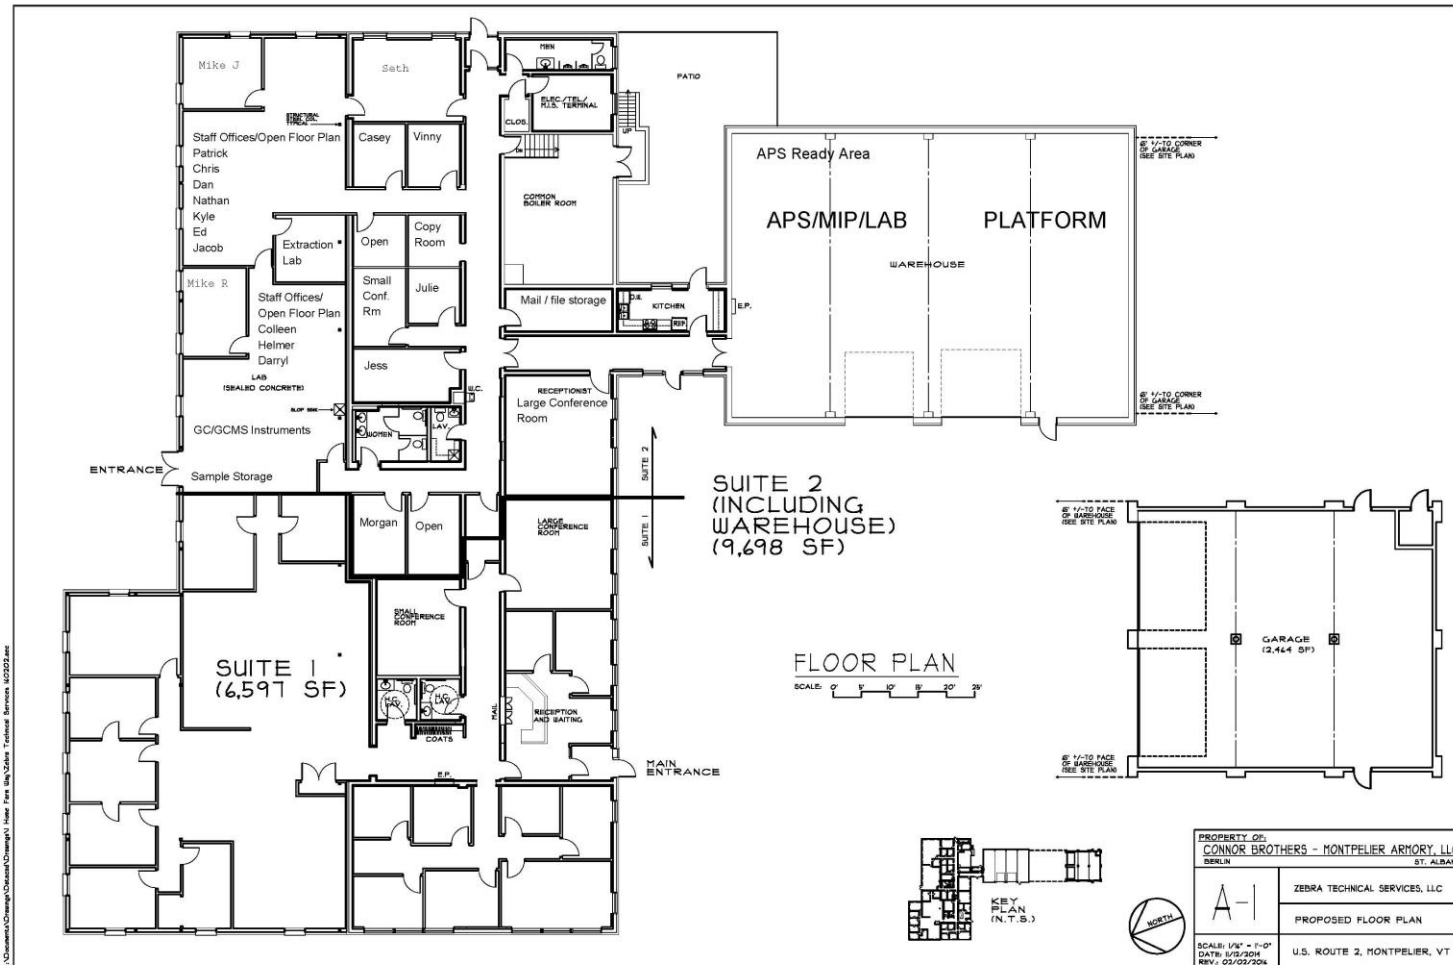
Floor Plan – Main Facility, Montpelier, Vermont
